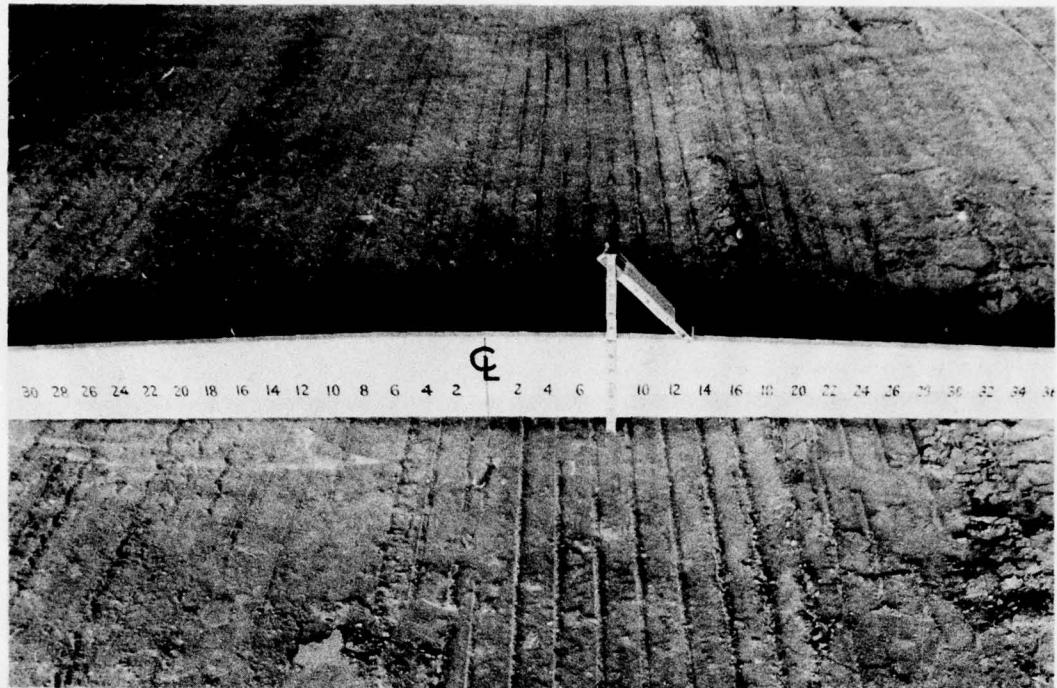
General view of Test Section No. 2, item 1, after 714 passes,
